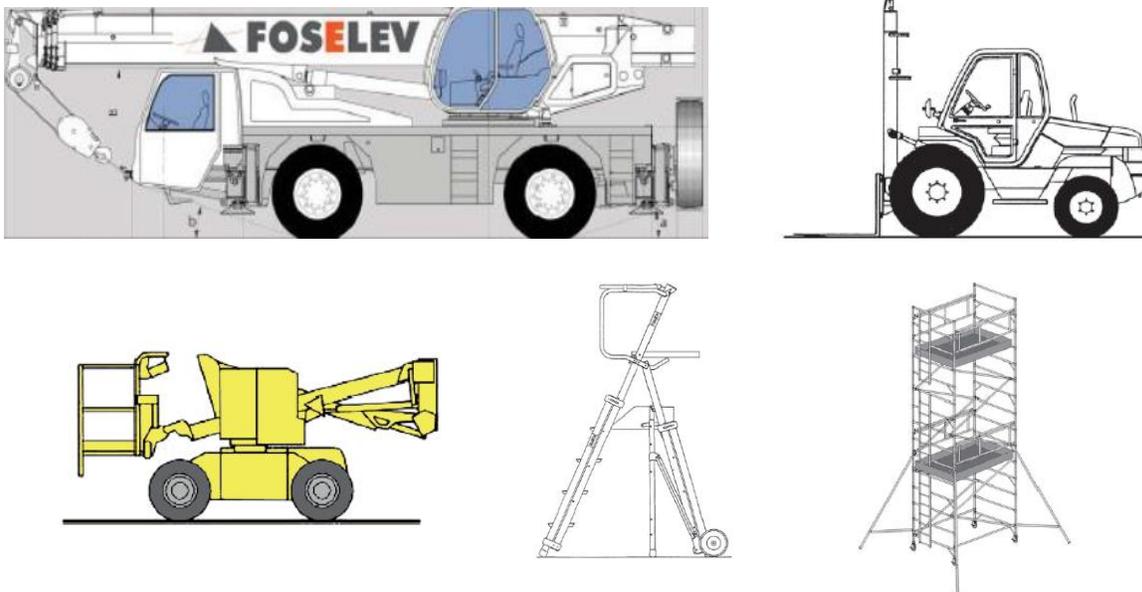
Machinery to be use in Tropika’s assembly and disassembly.
